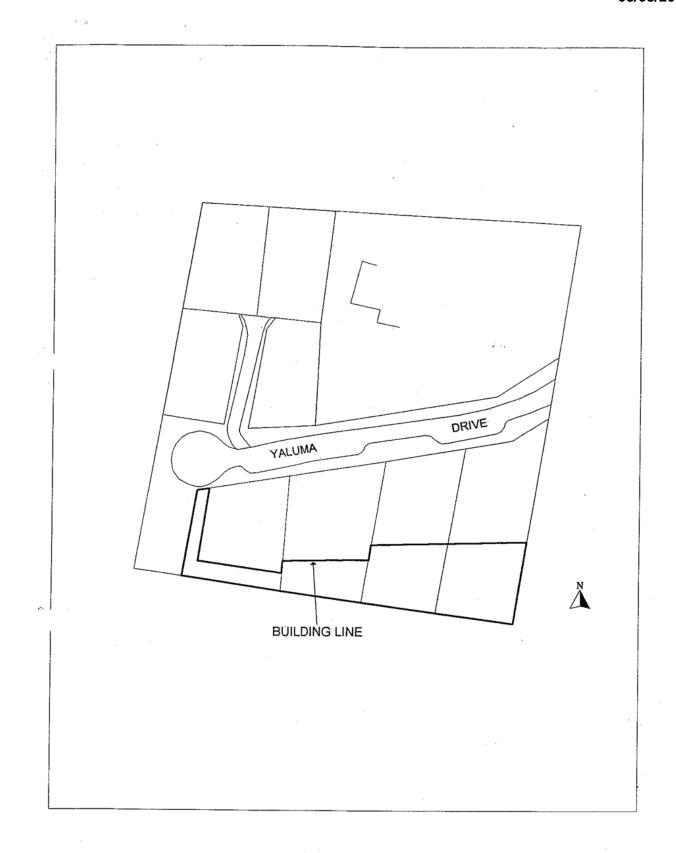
LOCATION OF PROPOSED BUILDING LINE
